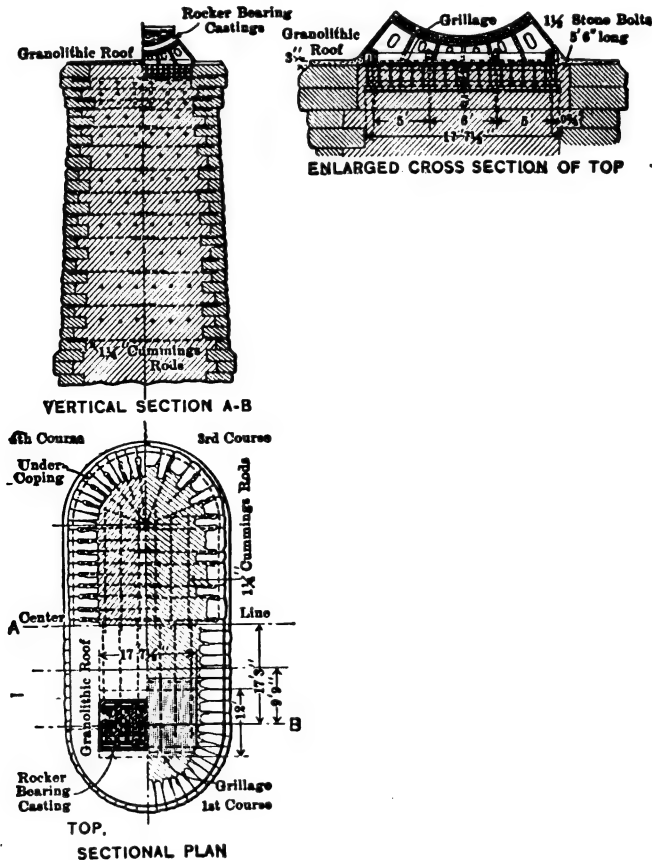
SECTIONS OF BEAVER BRIDGE, MAIN PIER.
